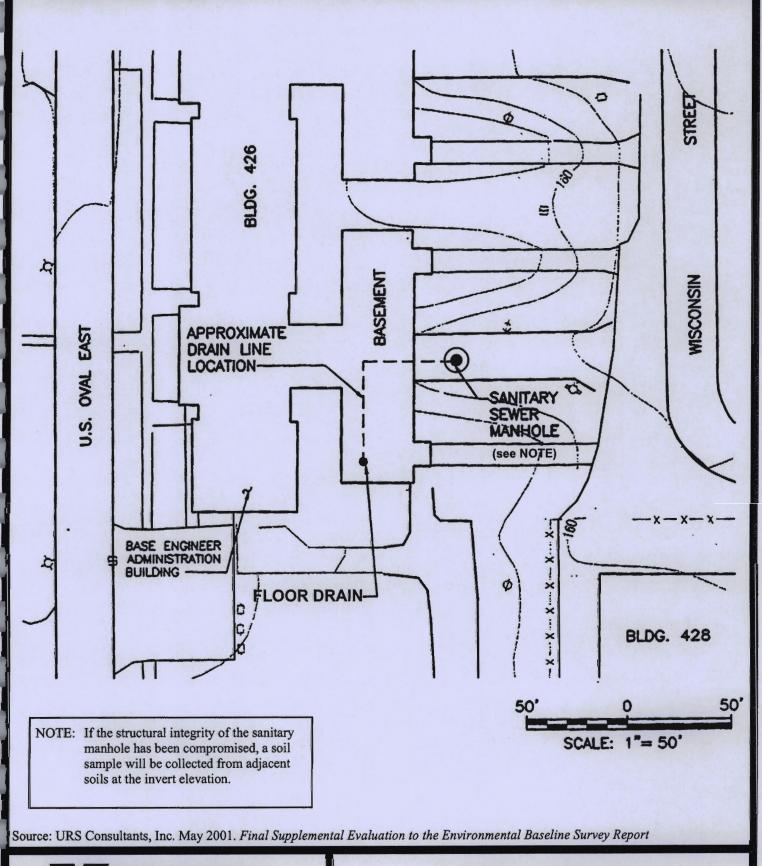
STW-426-2 SITE PLAN PLATTSBURGH AFT, NY
